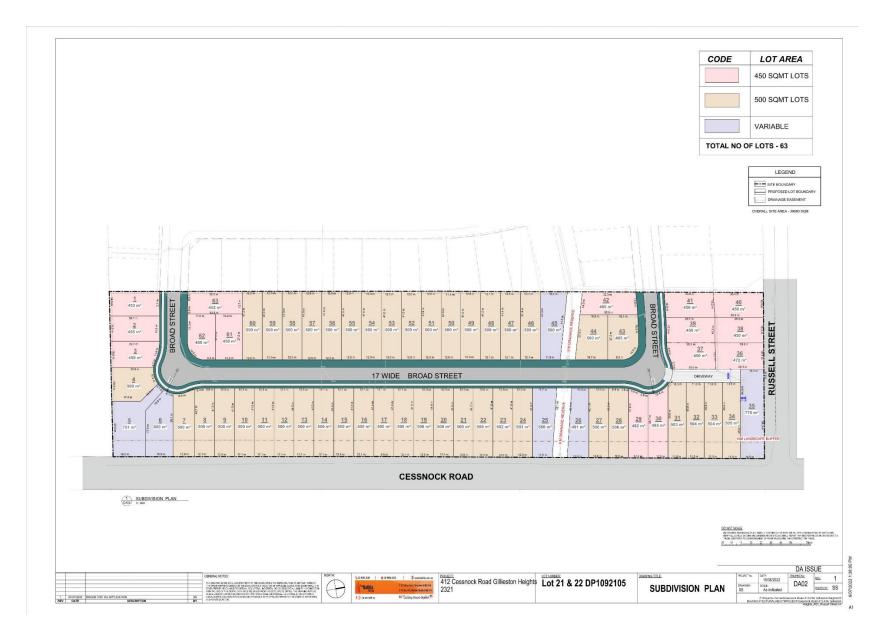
Subdivision Plan (Provided by The Bathla Group)
